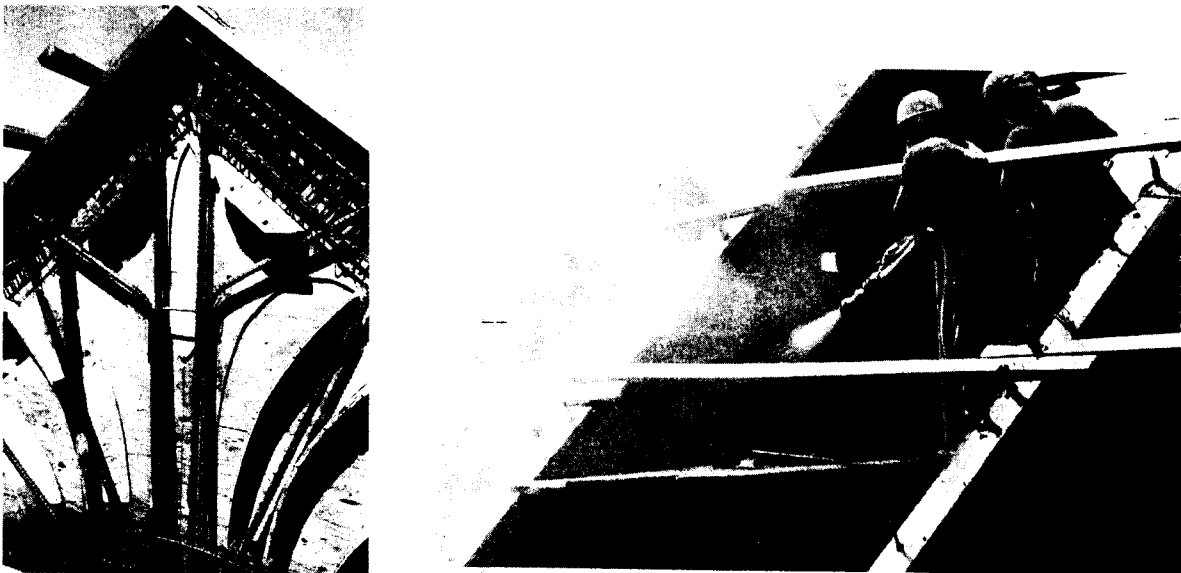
Construction Sequence Involved Assembling Forms and Steel on Ground, Lifting Assembly into Position, and Placing Concrete Pneumatically: (a) Form Work in Place, Ready to Receive Concrete; (b) Gunite Being Shot into Forms
